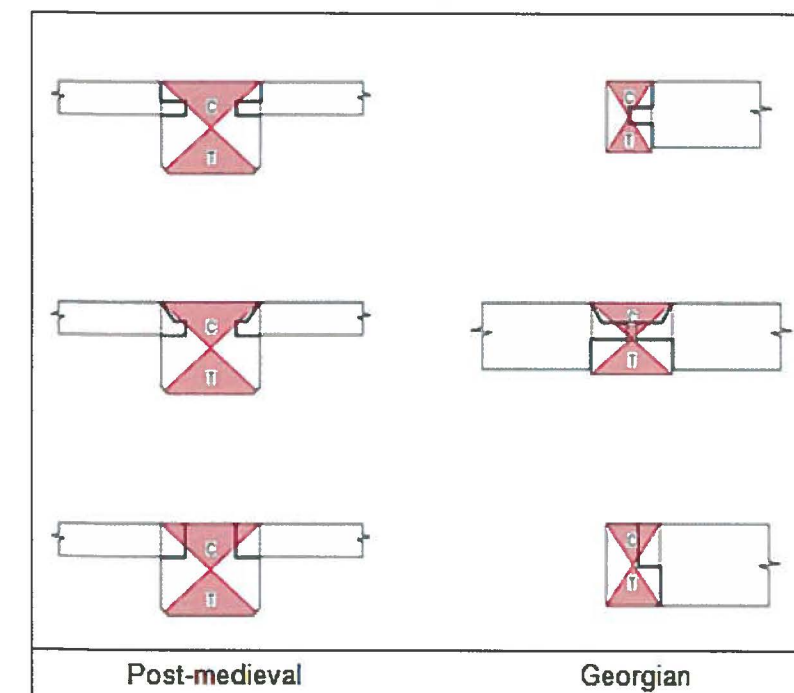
Comparison of Post-Medieval and Georgian Floor Framing, Showing Beams in Cross-Section with Three Common Joist-Beam Joints: Bare-Faced Soffit-Tenon (Top), Tusk-Tenon (Middle) and Butt Cog (Bottom). The Georgian Shift to Covered Framing Necessitated Deepening the Joist, with Various Consequences for the Preservation of Compression Wood (C) Versus the Strength of the Joist. The Tusk-Tenon Works Best in Both Cases, and Was Used in the Shivers House.
